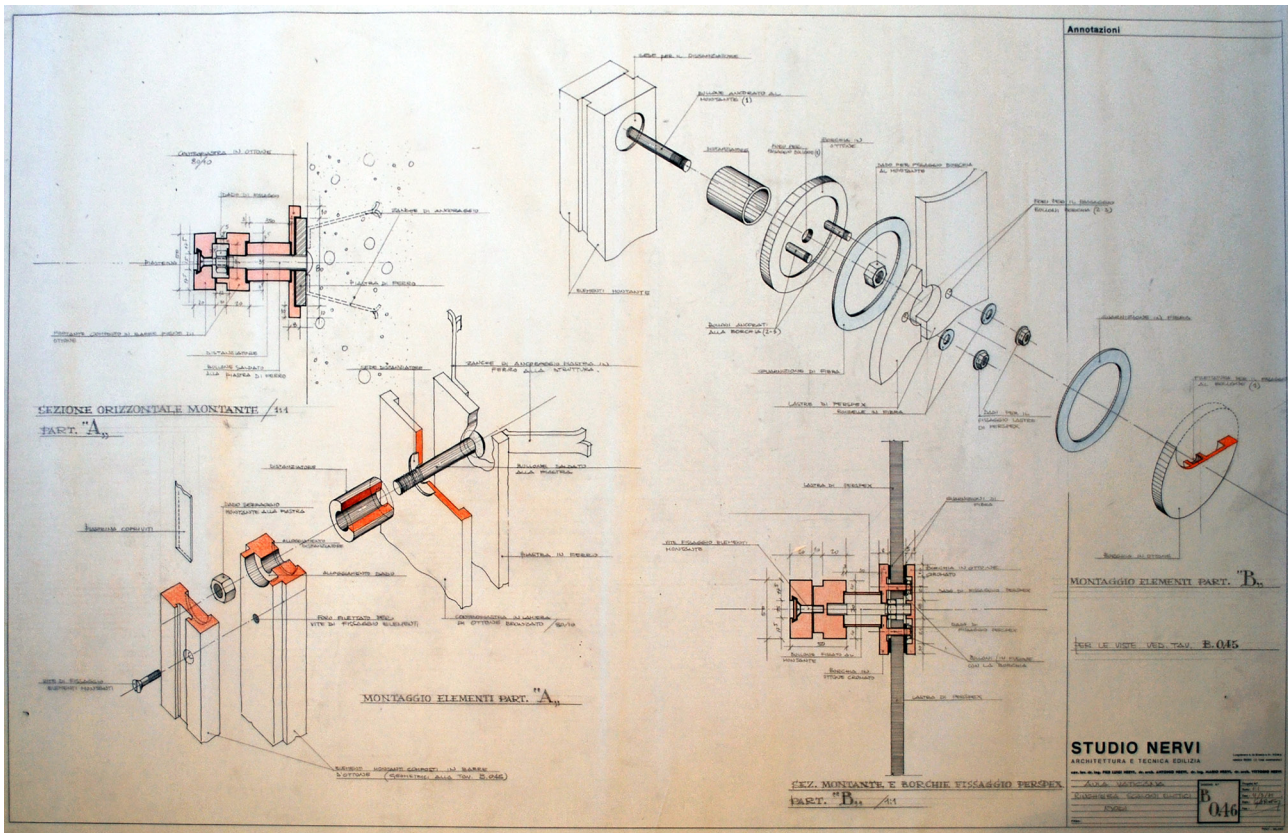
Pier Luigi Nervi, 1971. Papal Audience Hall - Vatican City. Vatican Hall - Elliptical staircase railing - knots [CSAC Parma, Project Section, Pier Luigi Nervi Fund] (photo by the author).
